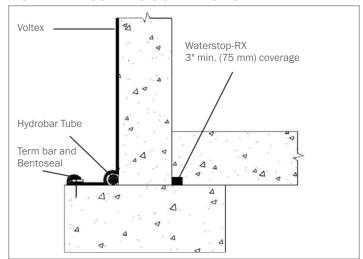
Slab on footing detail (non-hydrostatic)
